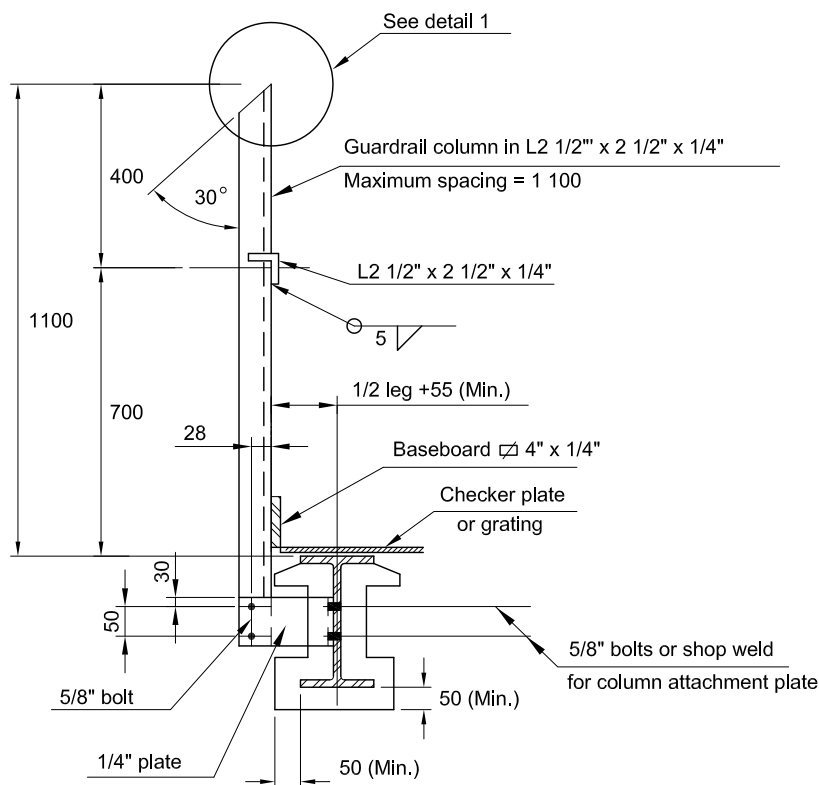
Typical Guardrail in I Beam with Fire Protection
